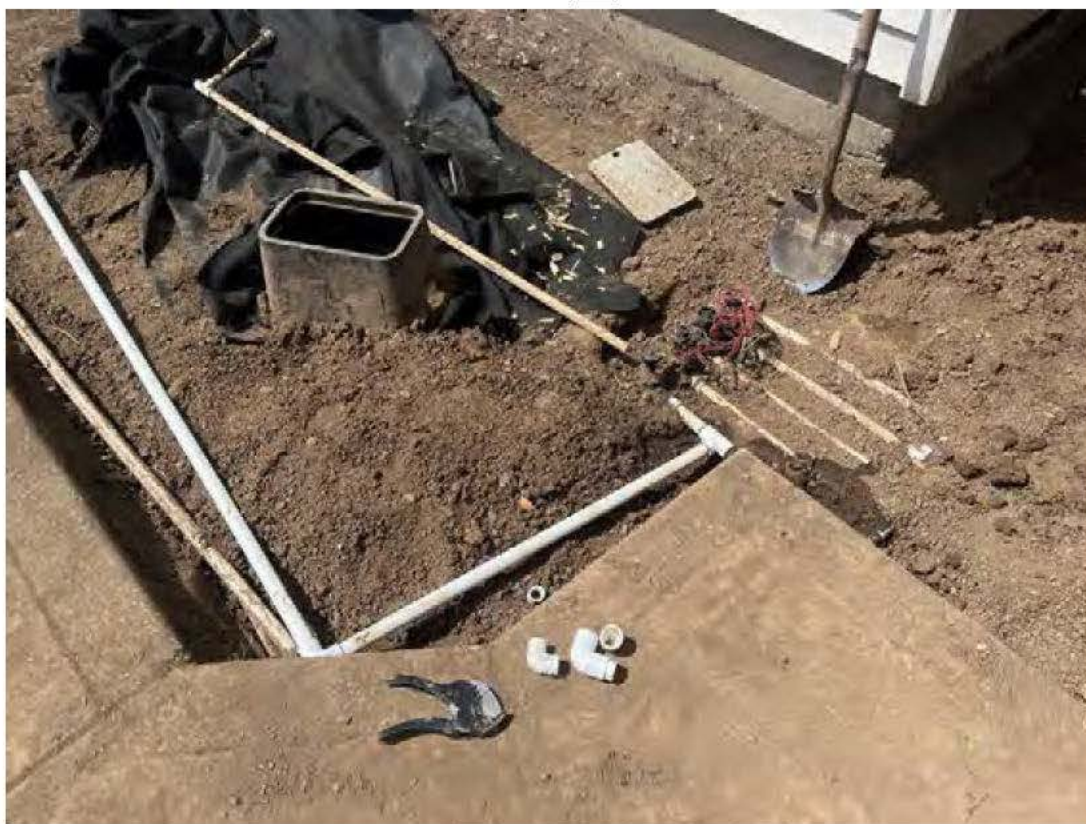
Manual excavation depth field truthing at [REDACTED] Baxter. Photo taken facing south.
